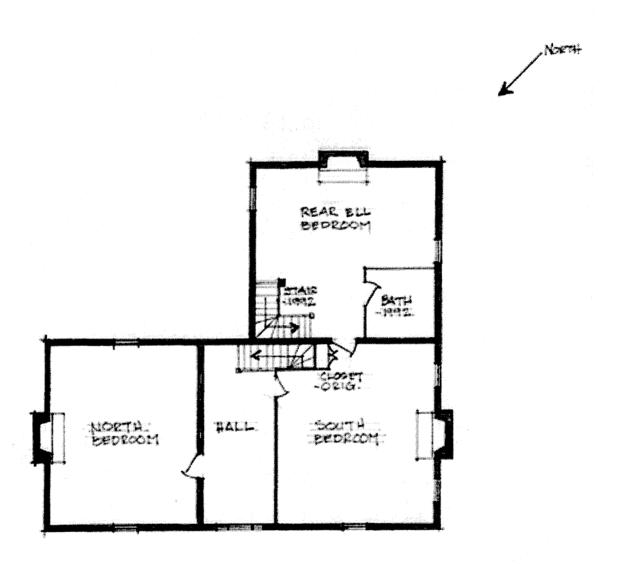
Dr. Benjamin Franklin Smith House, second floor plan (R. Jones). Scale: 1"=1'.
